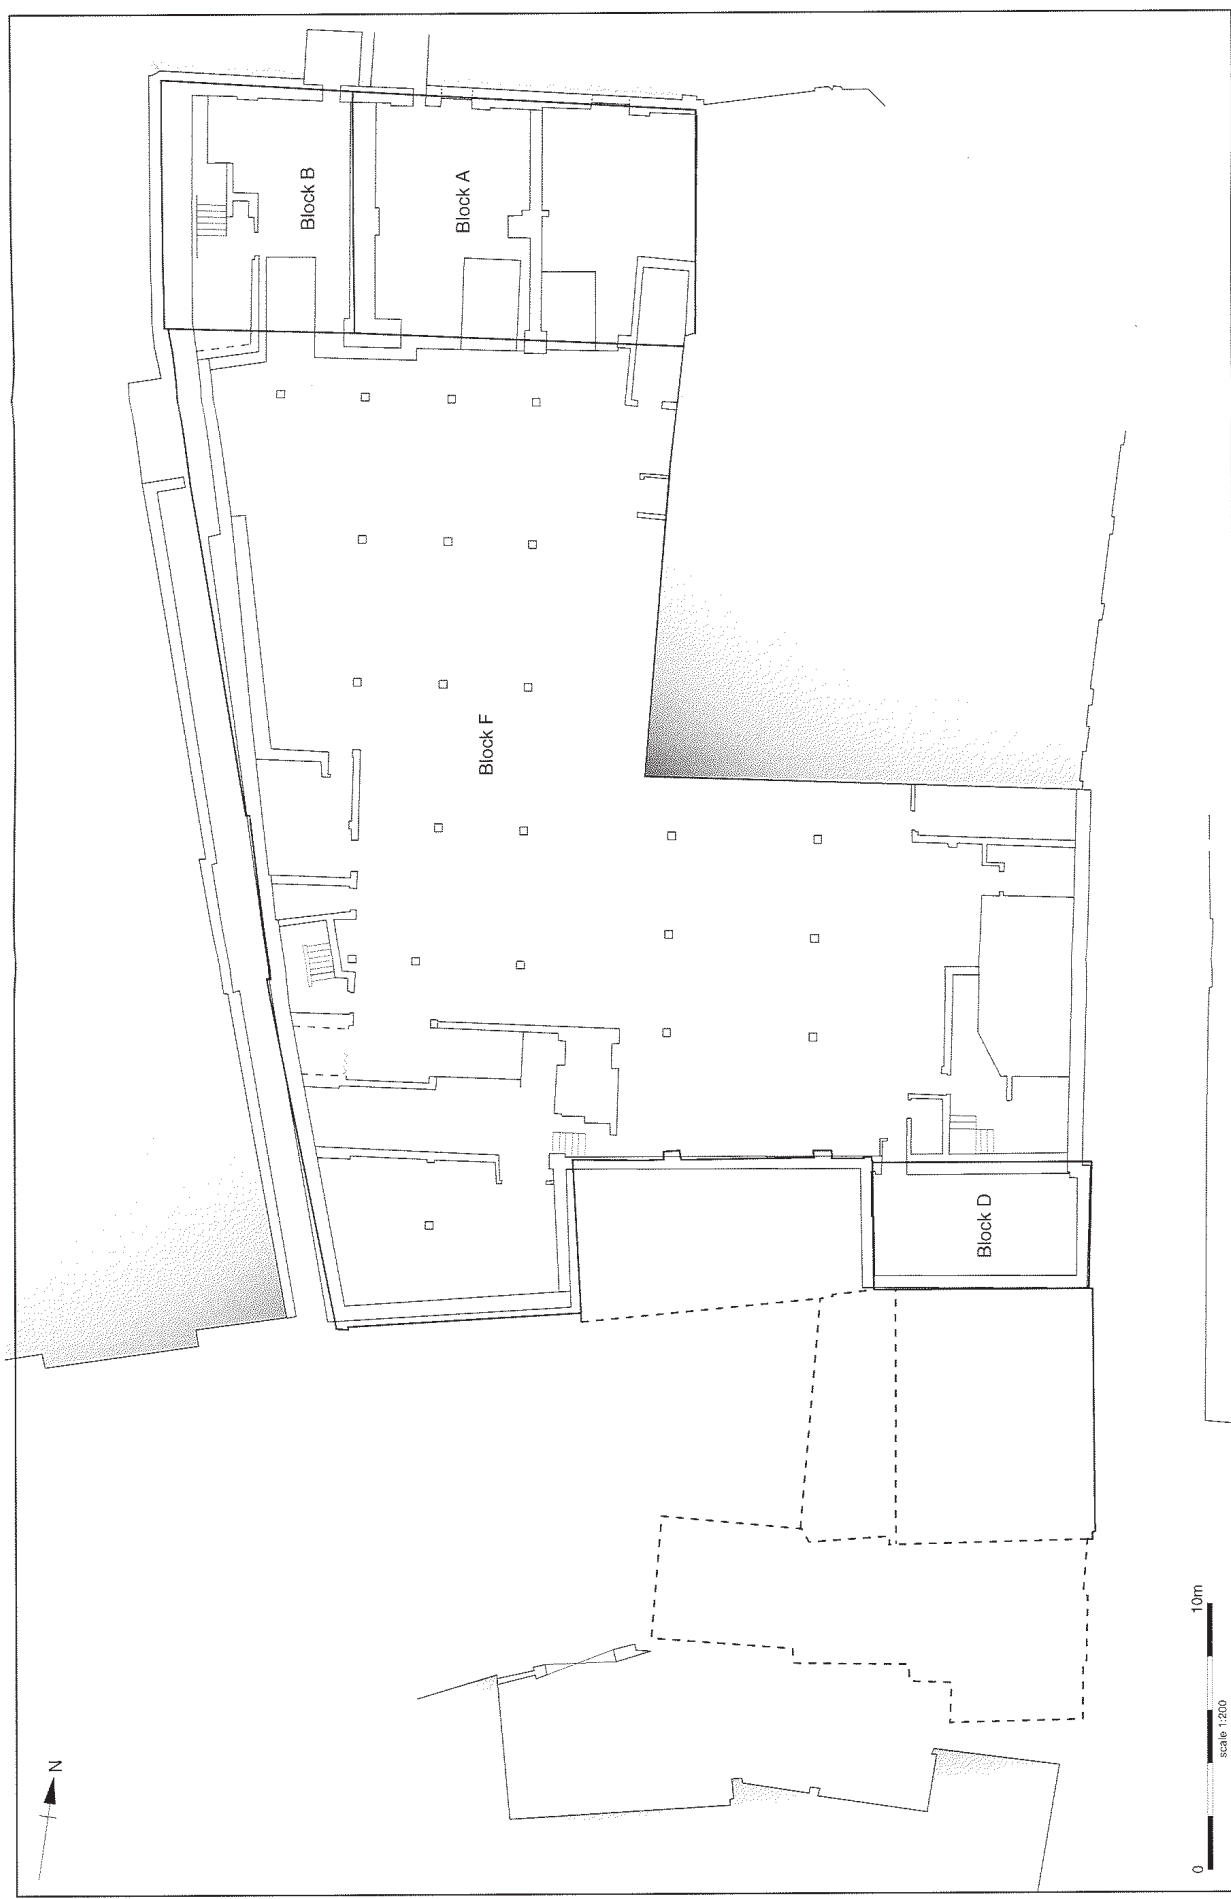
90-93 Broad Street, Reading, Basement Floor
